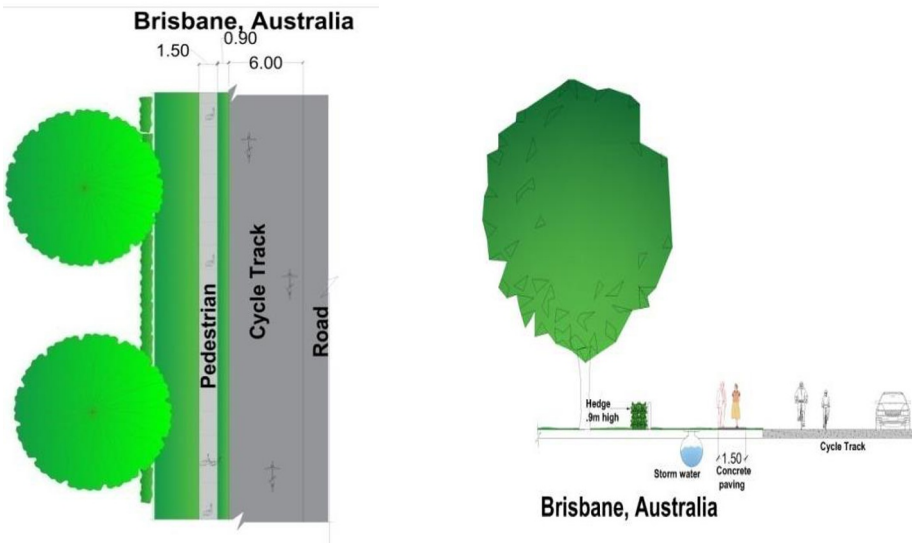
Brisbane pedestrian walkways typical plan & section. Source: - Author's
